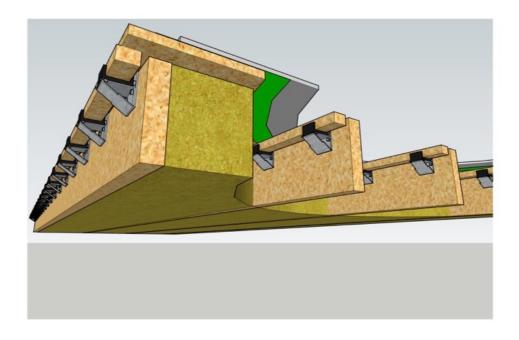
Metal holder for countersinking the U boat in wooden joists and possibly levelling floor joists.
